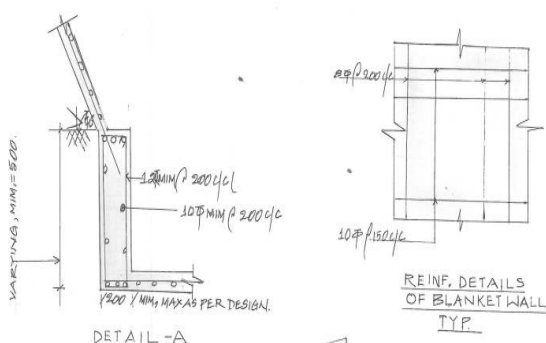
Reinforcement details of gravity beam & Blanket wall.
